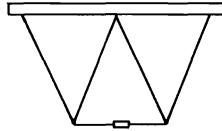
SCHEMATIC PLAN VIEW OF TEST RIG AND TEST PANEL
